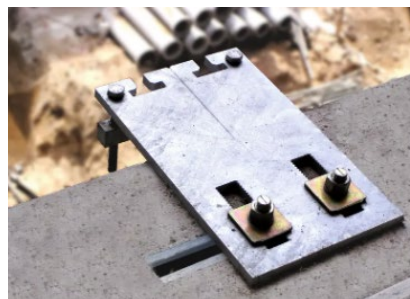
Halfen HCW B1 and Halfen HCW-ED/EW for post-beam facades. Two anchoring type Halfen HTA-CE Cast-in channels -YUW 750 TU unitised curtain wall edge anchor
